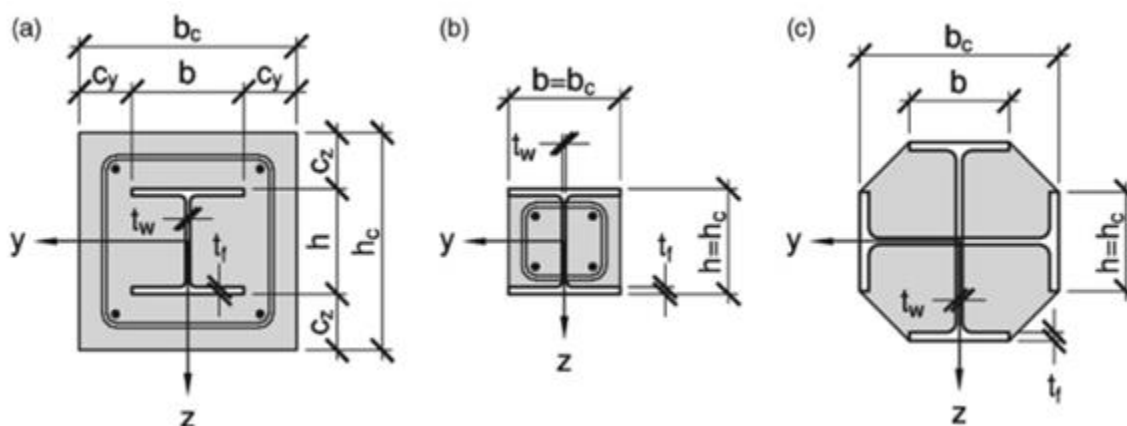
Typical Cross-Section of Composite Columns with Fully or Partially Concrete-Encased H-sections (Source: Buick Davison, 2012)
